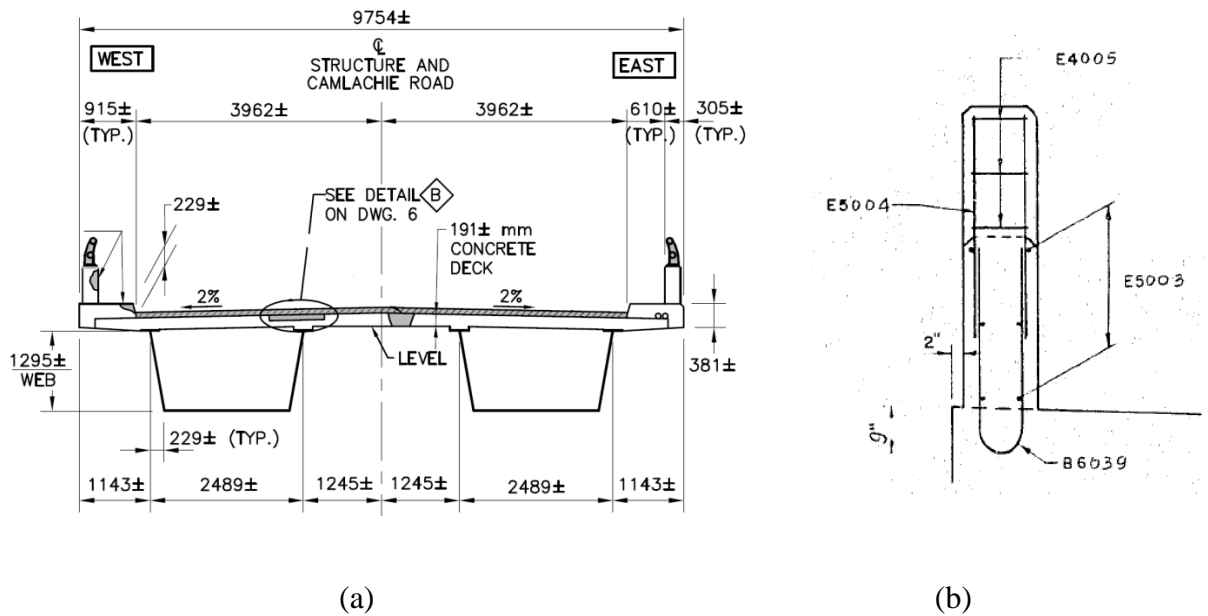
Camlachie Road Underpass Bridge (a) cross-section view and (b) parapet wall details [8]
